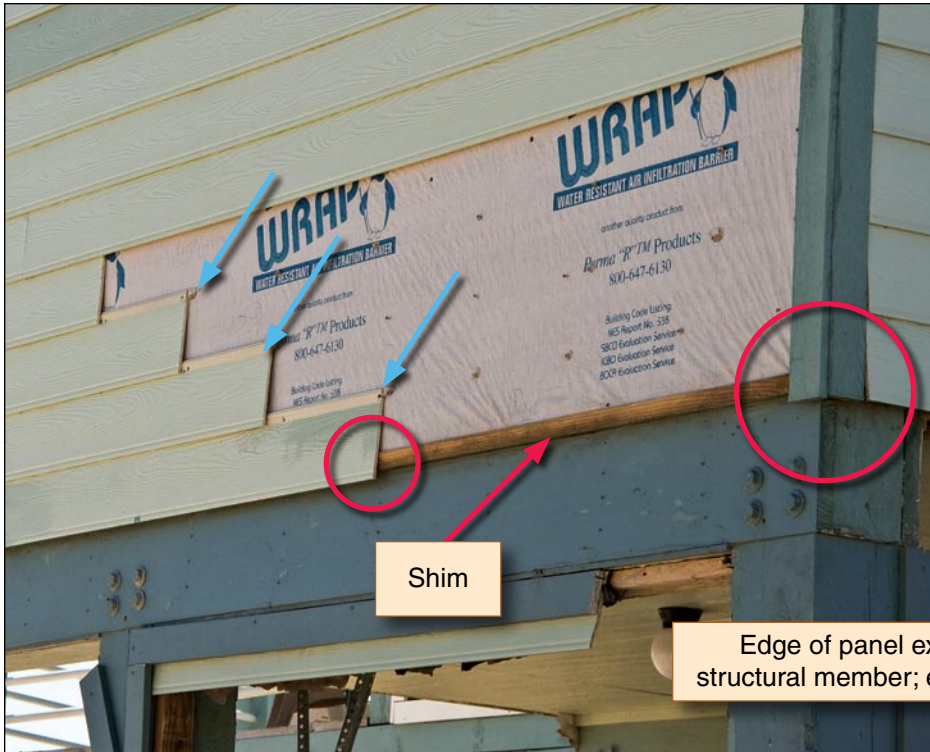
Shim placement (red arrow) allowed the lower edge (red circles) of siding to be exposed, resulting in loss of siding at several locations around this elevated structure on Bolivar Peninsula, TX. Note the blind nailing shown by blue arrows (Hurricane Ike estimated wind speed in this area: 110 mph, Exposure C).
